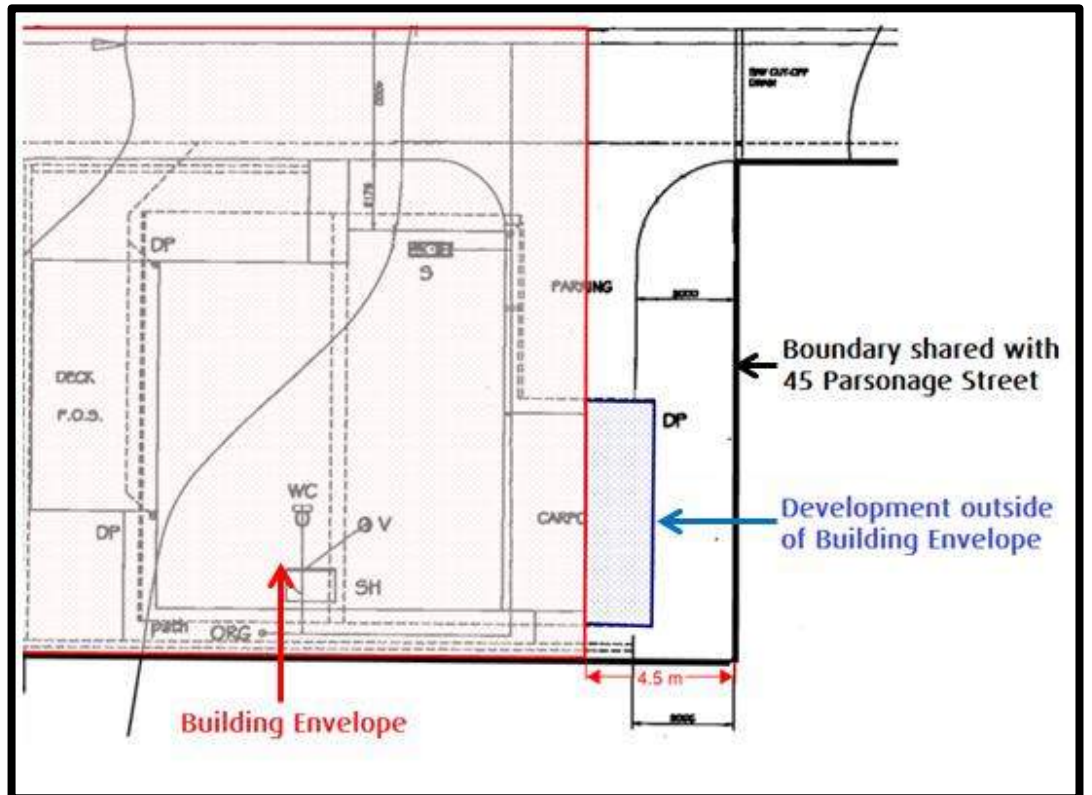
part site plan, showing Unit 1, the permitted building envelope in red, development outside the envelope in blue and the boundary shared with 45 Parsonage Street.
